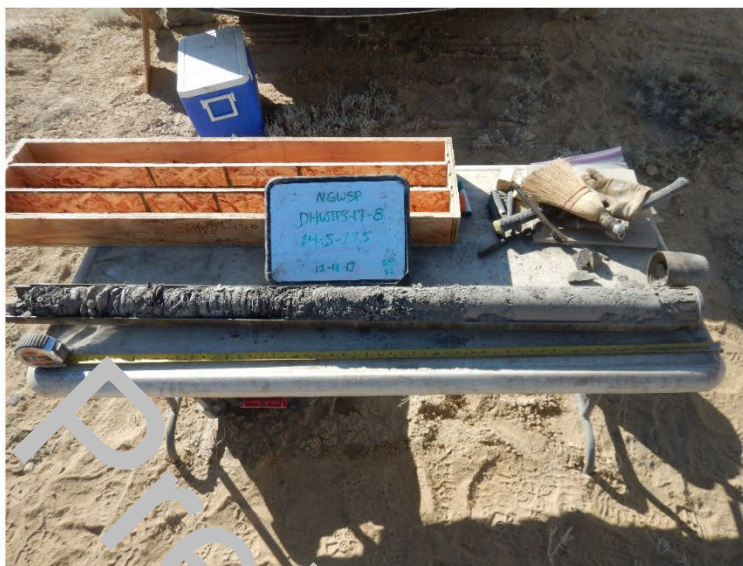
/18/2017 NGWSP, SJWTP, DHWT3-17-8 (24.5-29.5 feet). Photo By: P. Gardner
